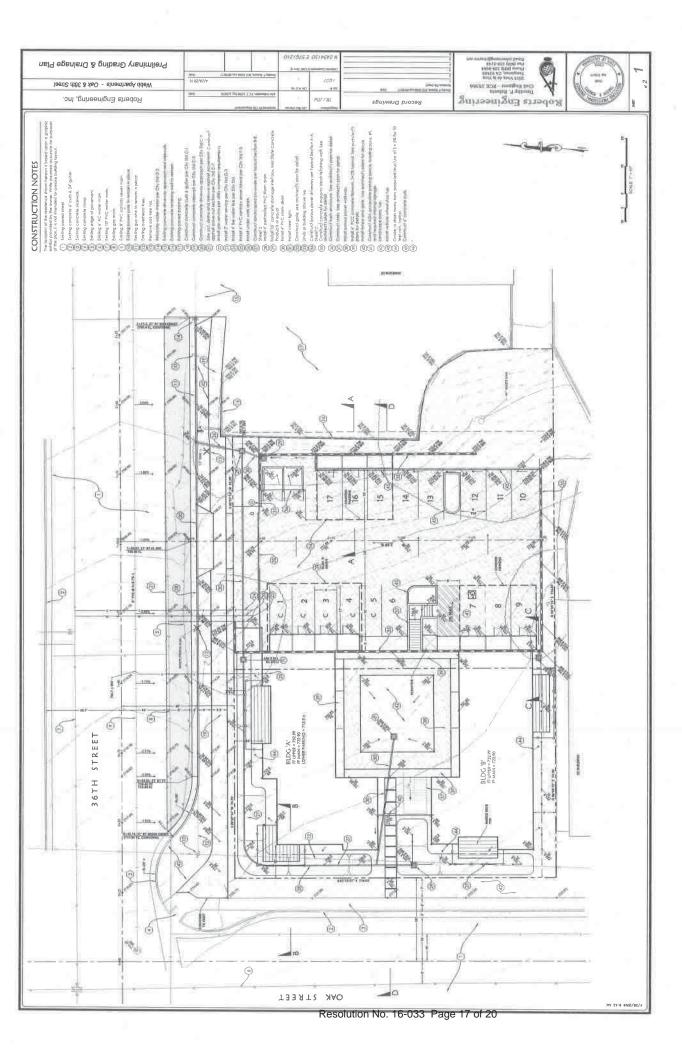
Exhibit E Prelim. Grading & Drainage PD 16-003 (Webb Apartments)
